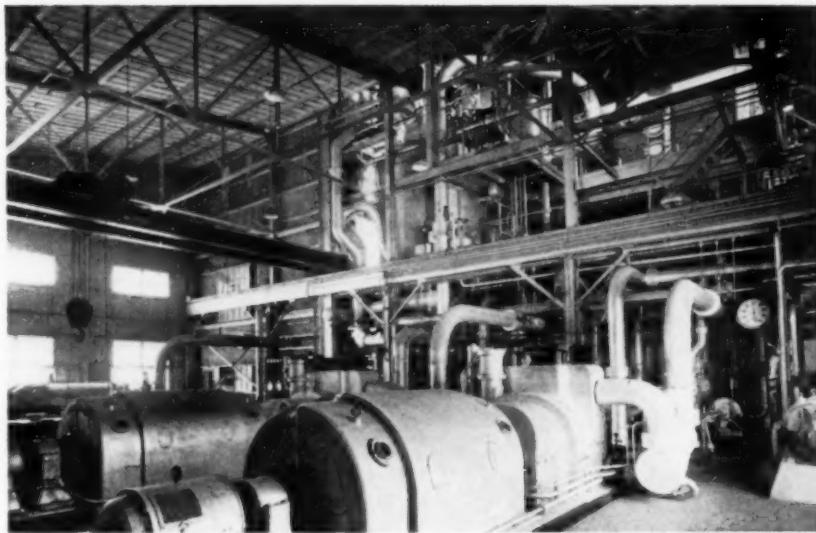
Corrugated asbestos board was used for the walls, and gypsum planks for the roof slab, in the plant of Southern Alkali Corp., Corpus Christi, Tex.
